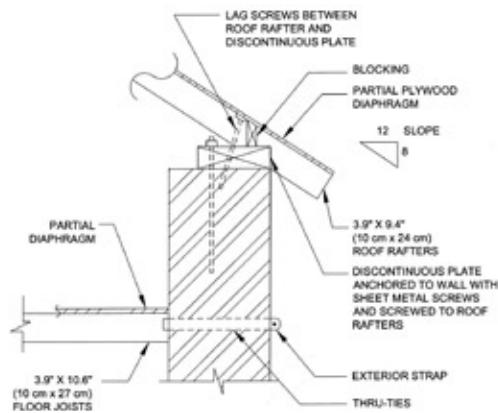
For models 7 and 9, connection and roof and floor partial diaphragms at load-bearing walls. Note that dimensions are prototype dimensions.
